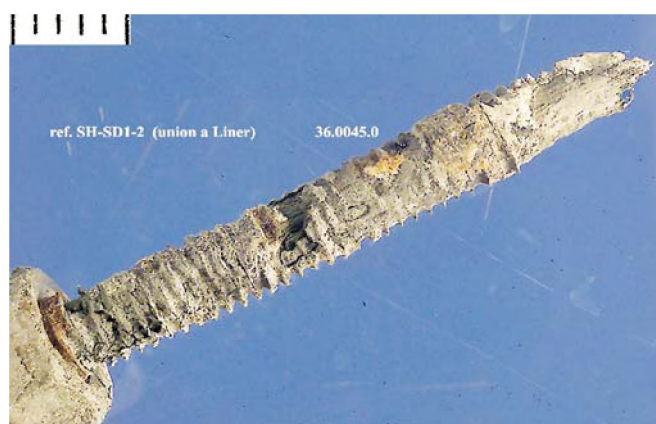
Detail of liner-sensor joint SH-SD1-01.
